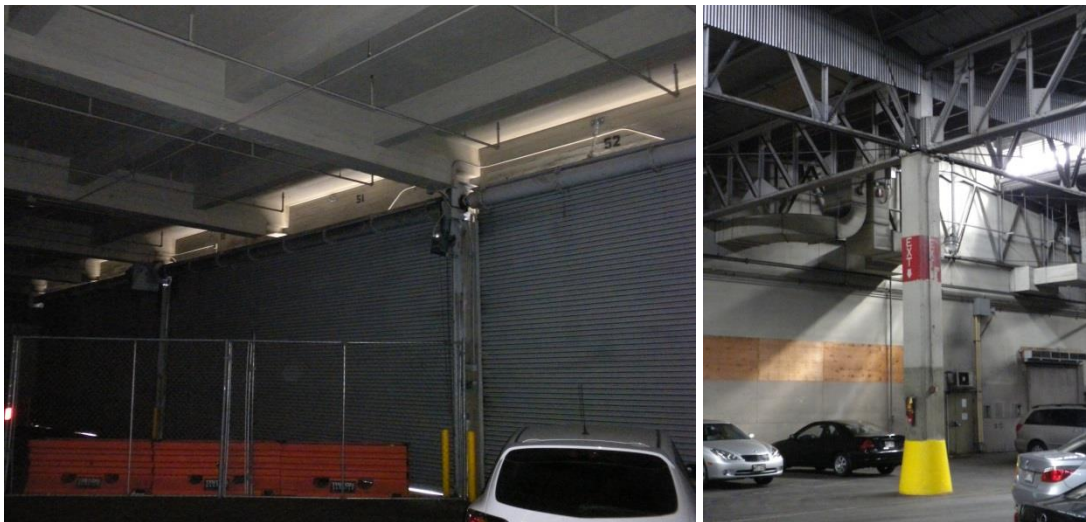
Structural framing members in warehouse on Piers 10 and 11.
